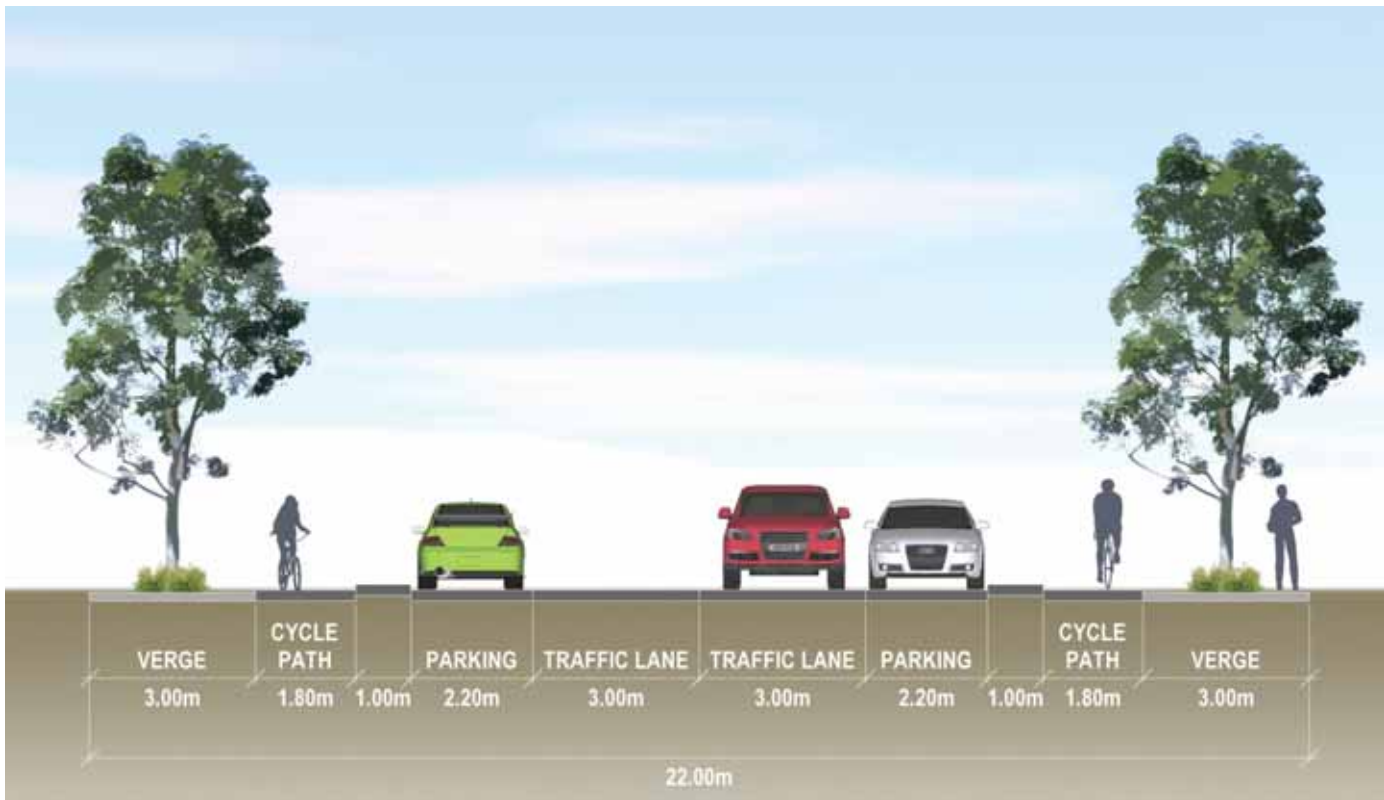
Hertha Road Conceptual Cross Section (without Hertha Road Freeway Ramps)
